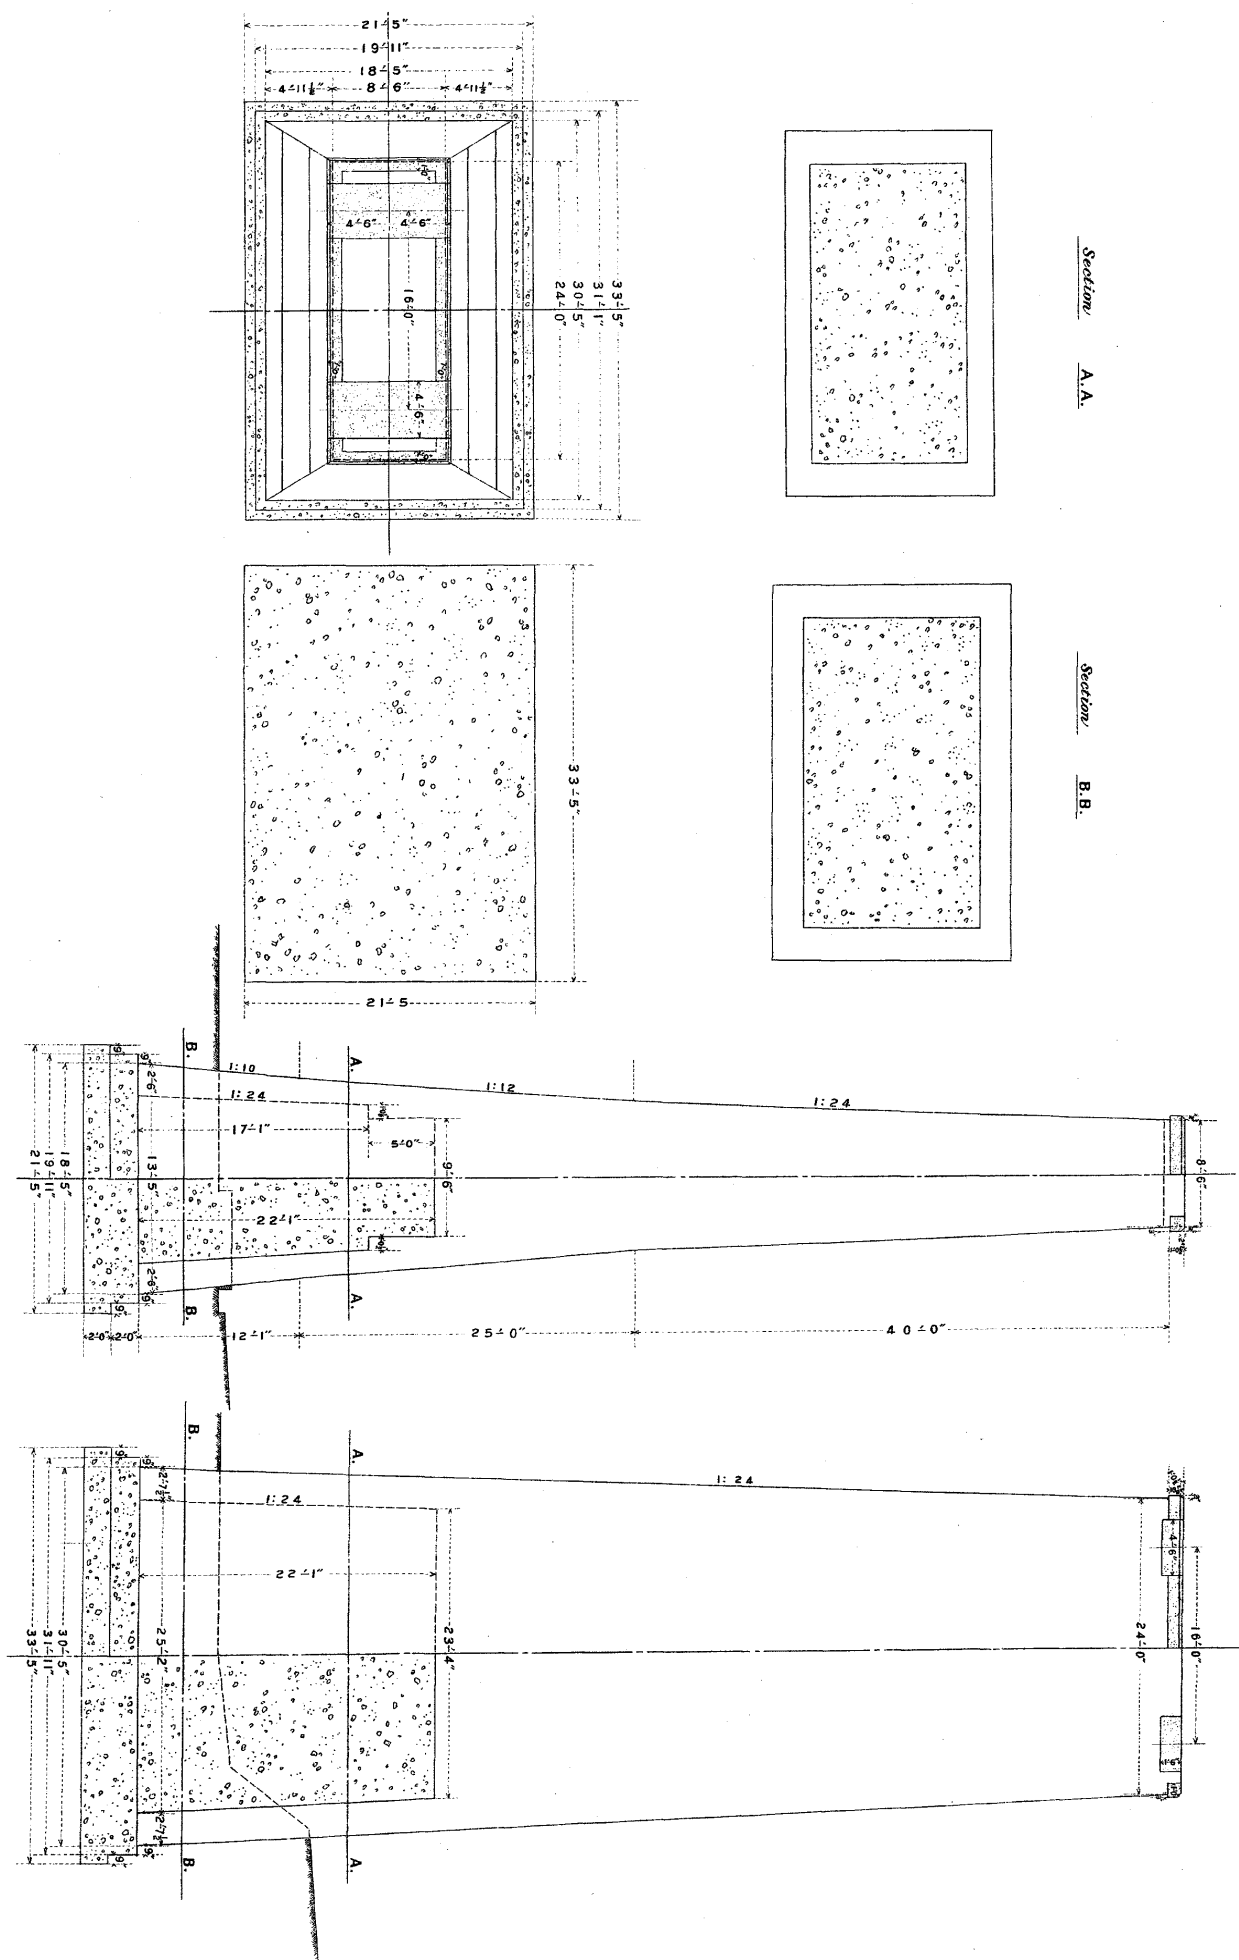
Elevations and Sections of Pier No. 5 of the Shichimi-gawa Bridge.
